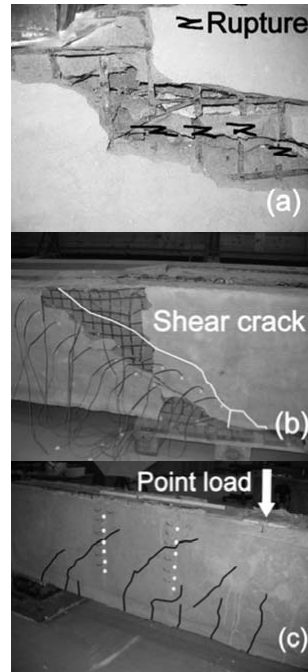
Ultimate shear failures: (a) rupture of vertical CFRP tows; (b) ultimate shear crack and SGs; and (c) crack formations in strengthened shear span for specimen K30s3-M2-G2
